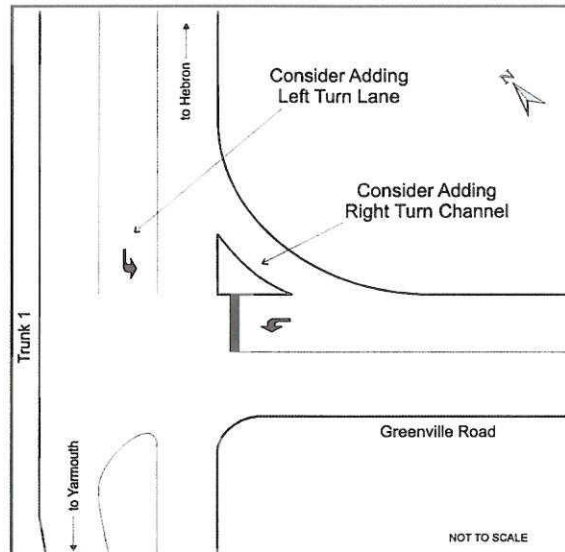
Proposed improvements to the Trunk 1 - Greenville Road Intersection
